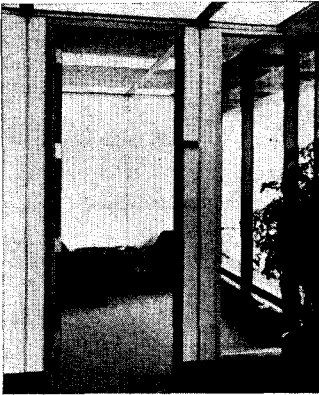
Private Reading Room. Walls are vinyl covered gypsum board to ensure quality soundproofing of the modular units.
